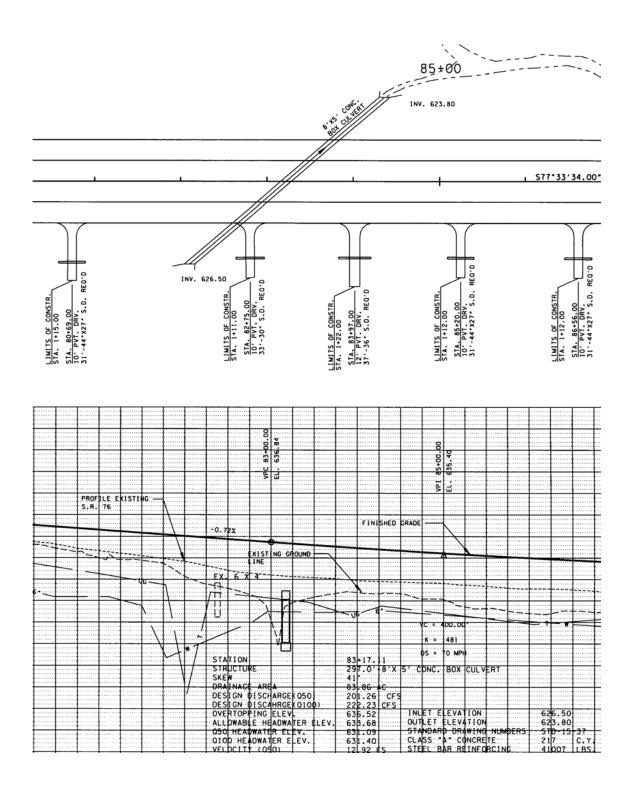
A-7. Portion of Proposed Layout Sheet (Box Culvert)
